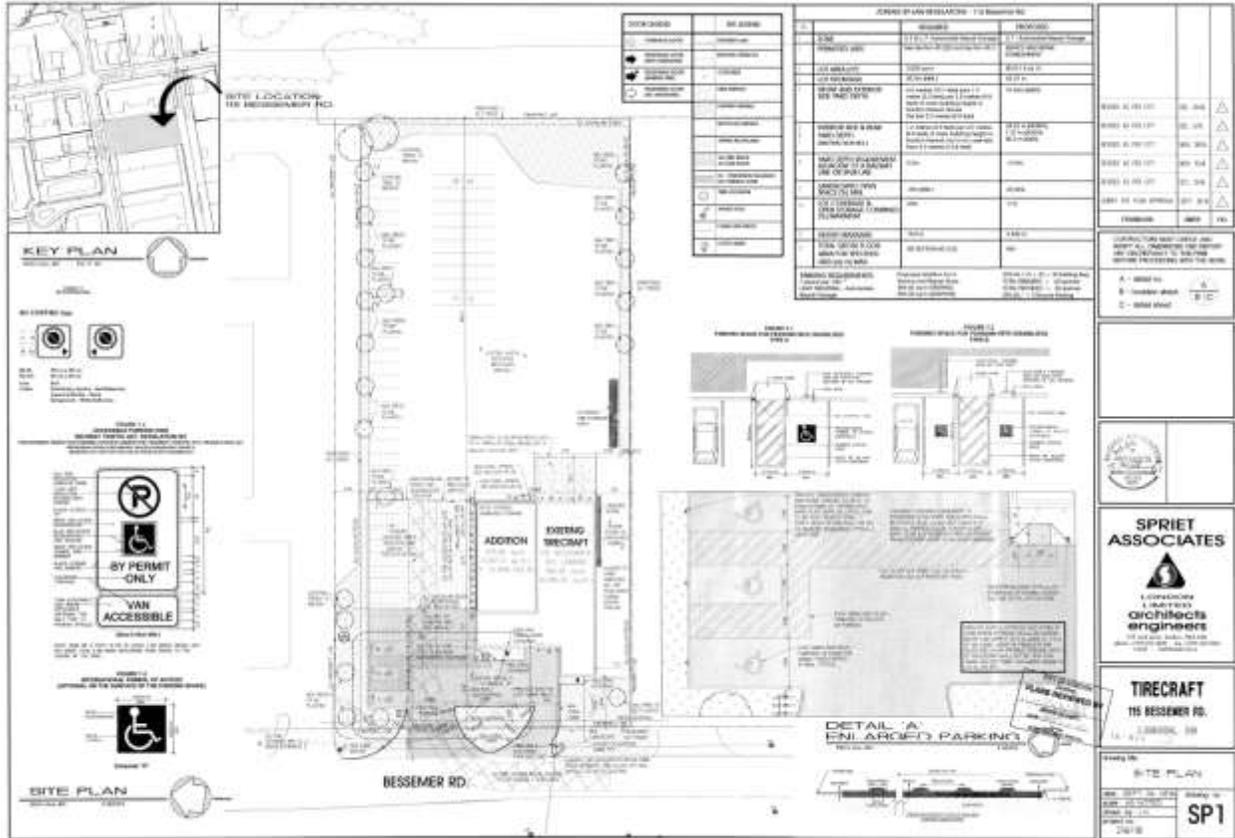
Site Plan (Approved Site Plan – SPA 16-084)
